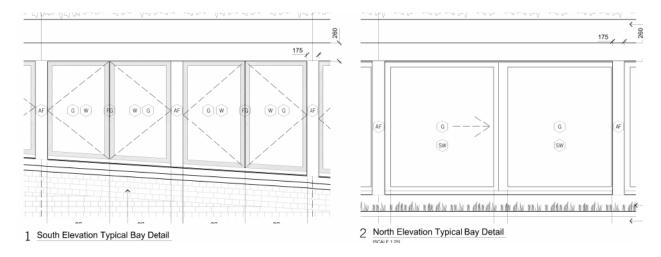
Proposed windows opening strategy for the north and south conservatory elevations.
